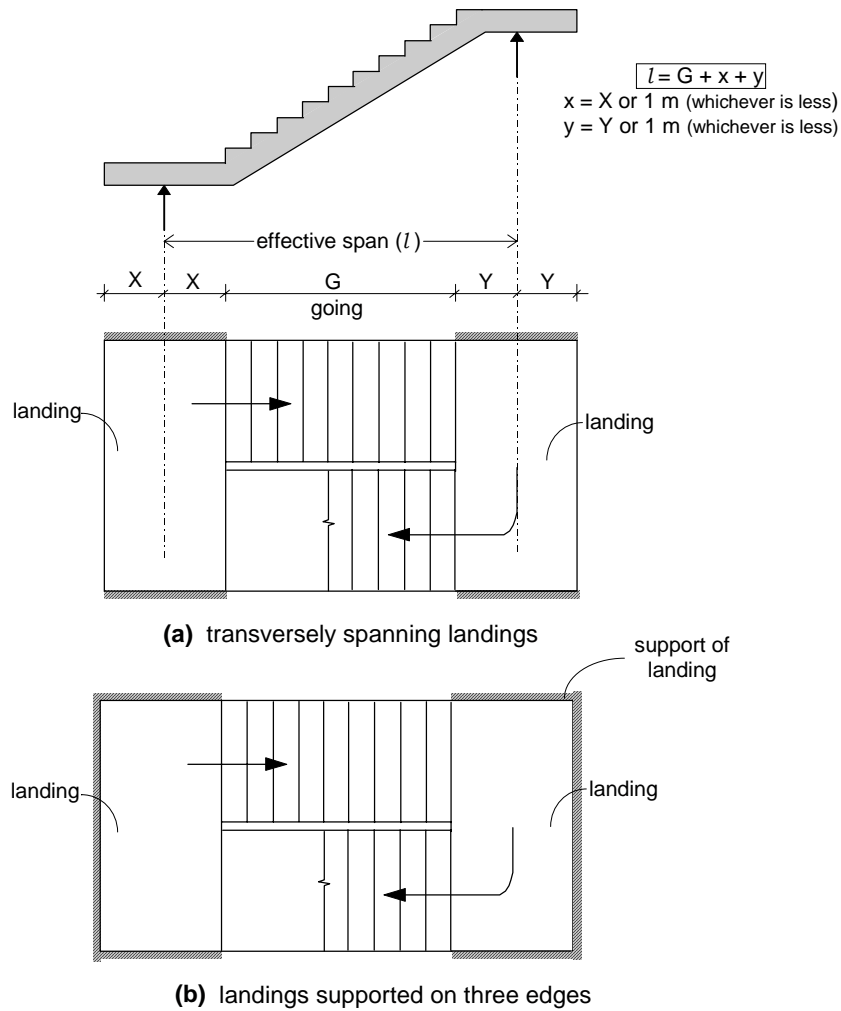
Special support conditions for longitudinally spanning stair slabs
